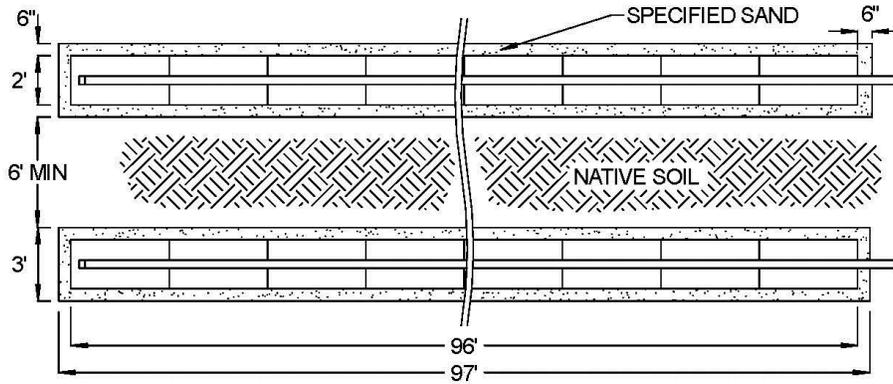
SECTION VIEW – TRENCH SYSTEM – LEVEL SITE
